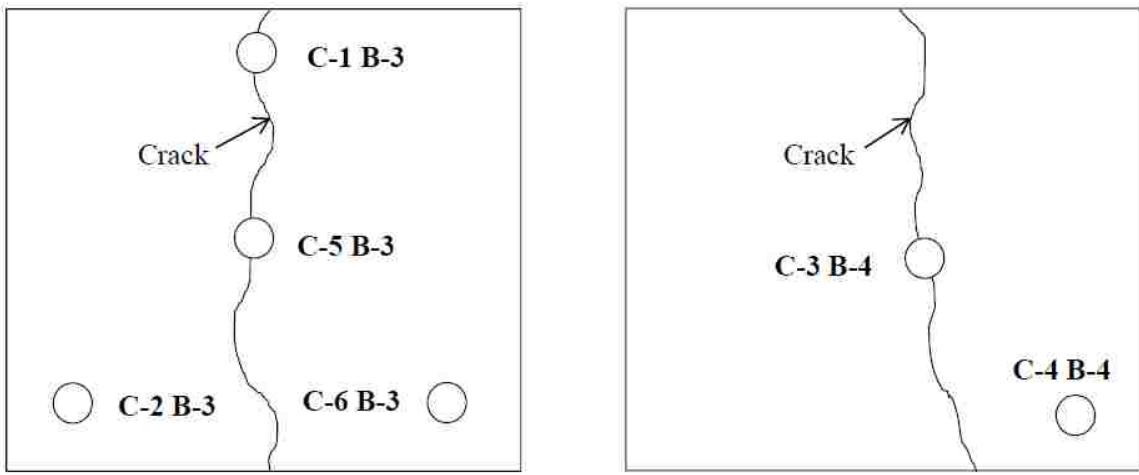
The locations of core extraction from No. 3 (left) and No. 4 (right) box culvers
